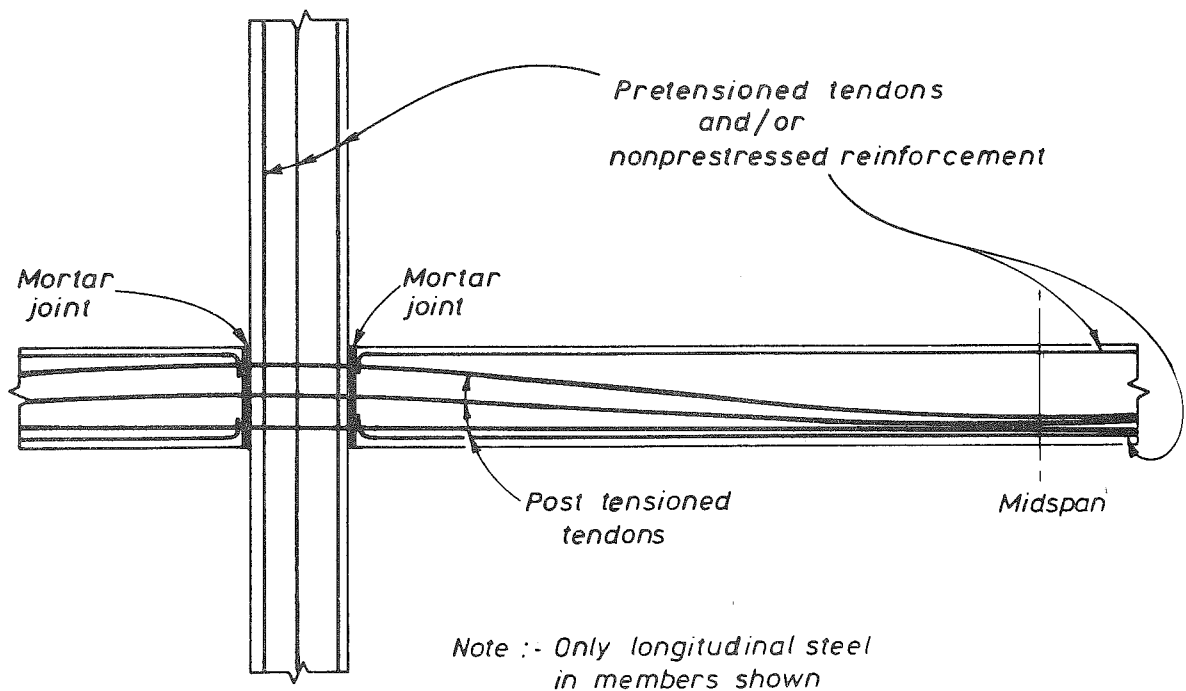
System 1 Structural Configuration for Constructing Continuous Frames from Precast Concrete Elements.
